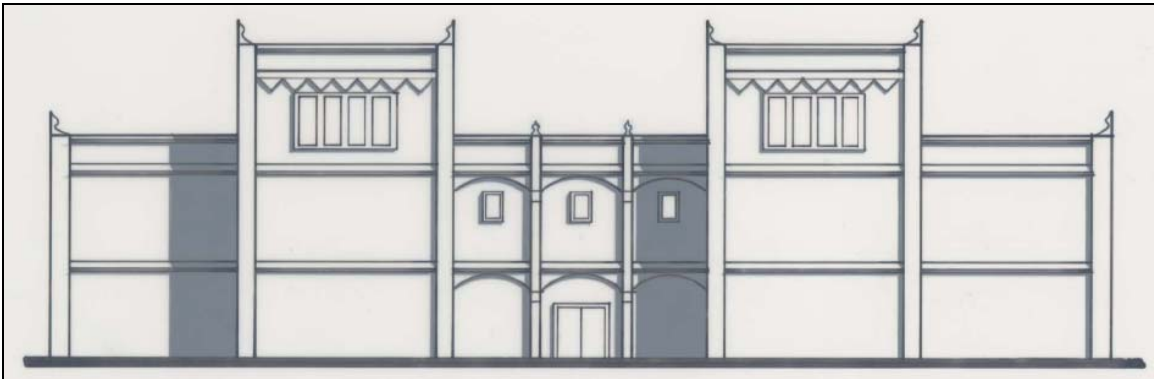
Front Elevation. The exterior elevation shows the fortified walls and some of the characteristic architectural elements of Middle Eastern traditional design.
